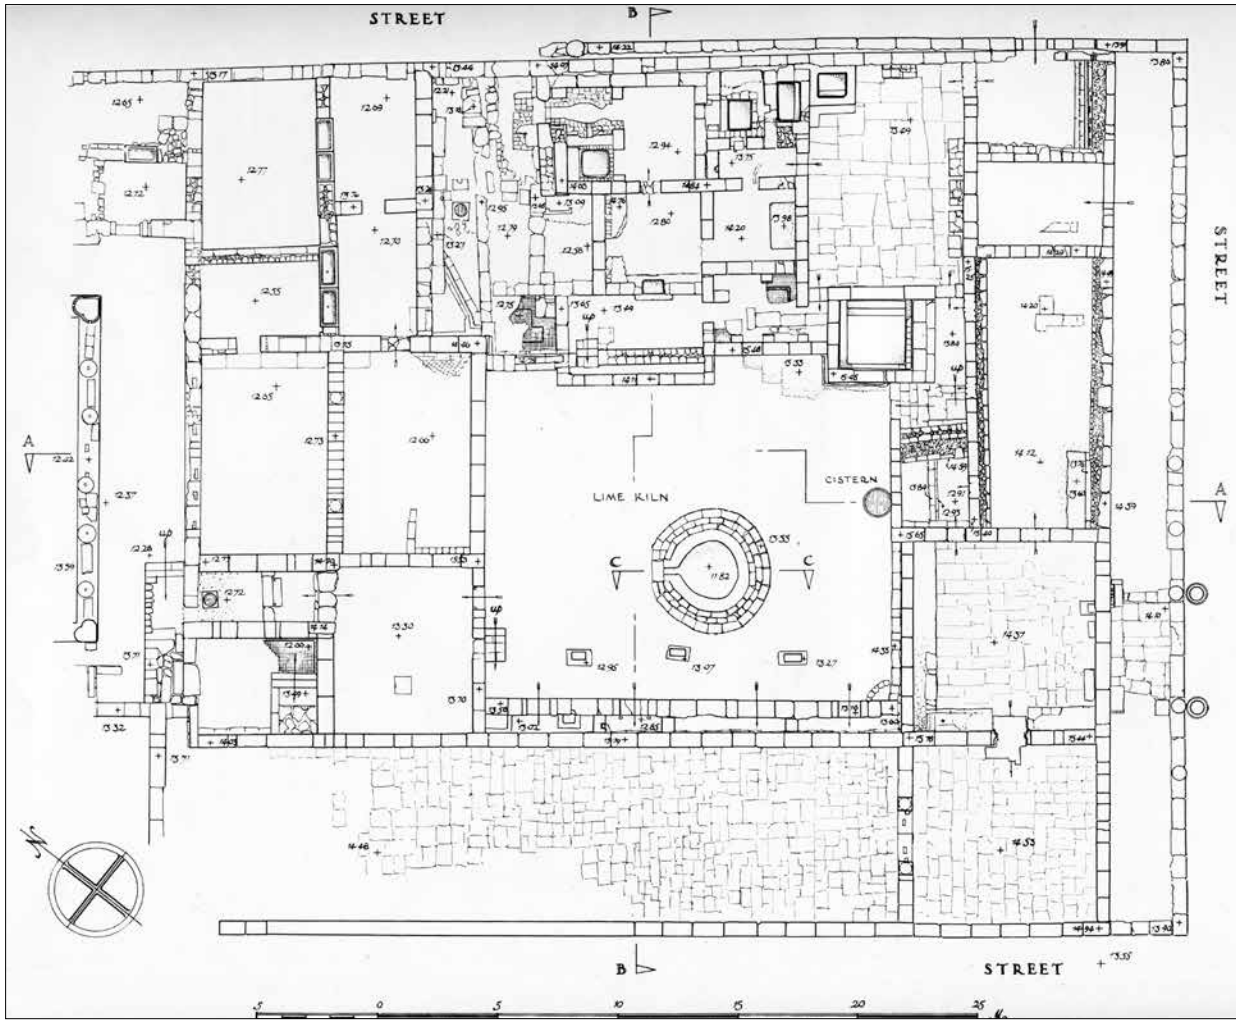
a. *Ptolemais*, House of Paulus, plan (after Kraeling 1962, plan XVI).
